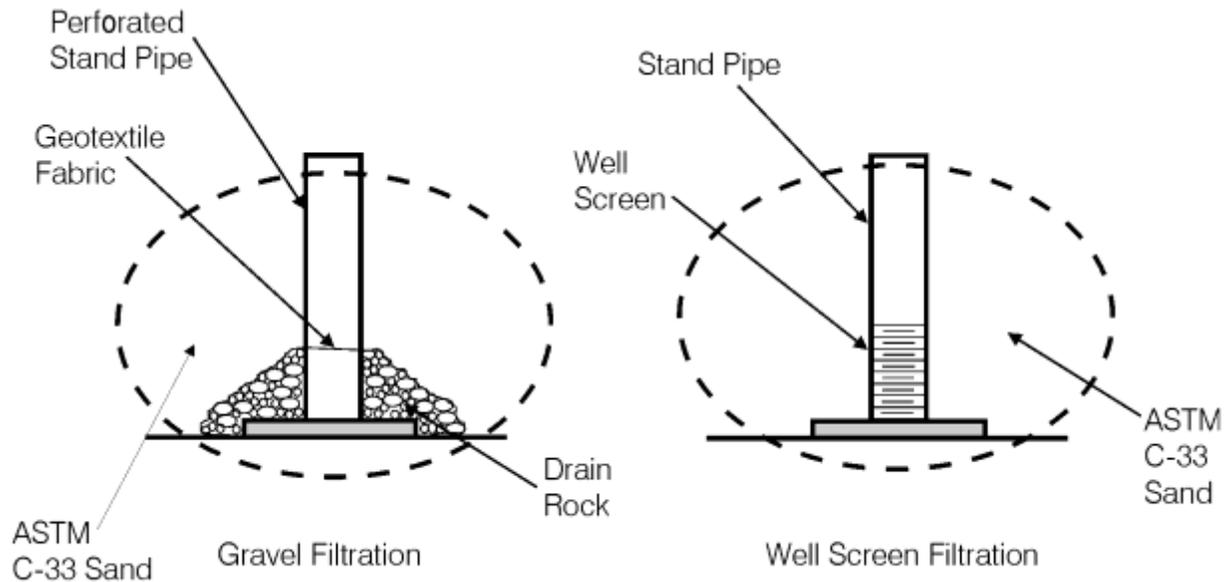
Two Examples of Properly Constructed Stand Pipes
